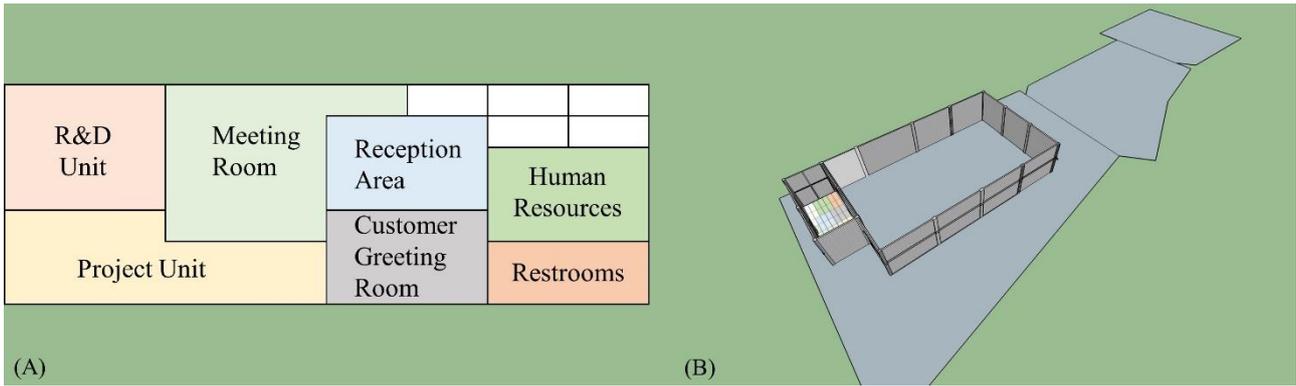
(A) Arranged department placement for the 1<sup>st</sup> floor office area. (B) Placement of the 1<sup>st</sup> floor office area layout into the 3D model of the facility.
